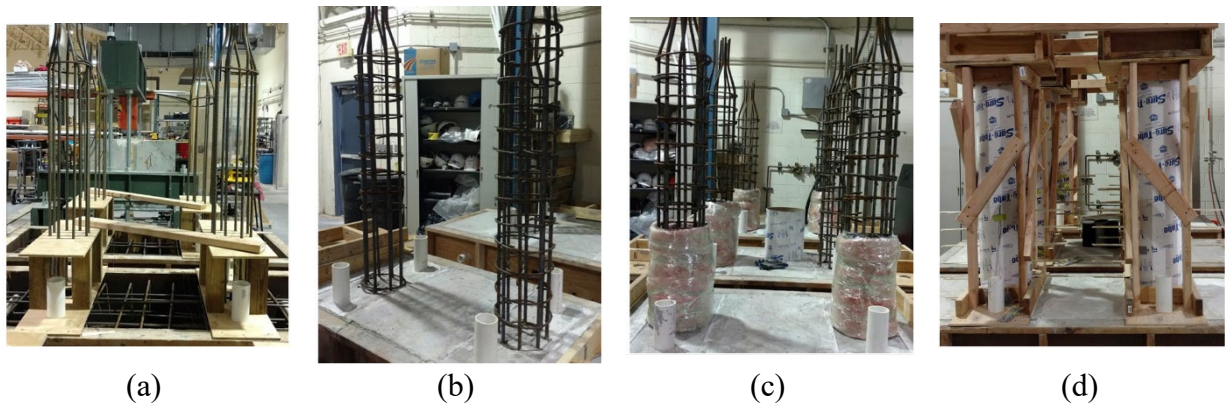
Construction process of a typical specimen: (a) formwork and caging; (b) casting the footing; (c) simulating the damage; and (d) erecting the columns and casting the concrete substrate (Farzad et al., 2019).
